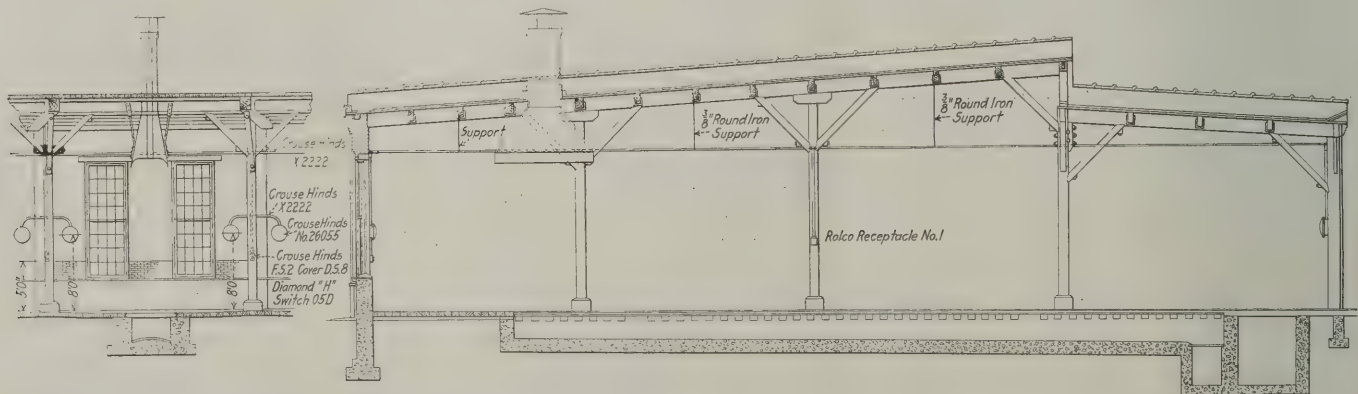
Cross-Sectional Elevation Showing Location of Reflectors and Conduit
